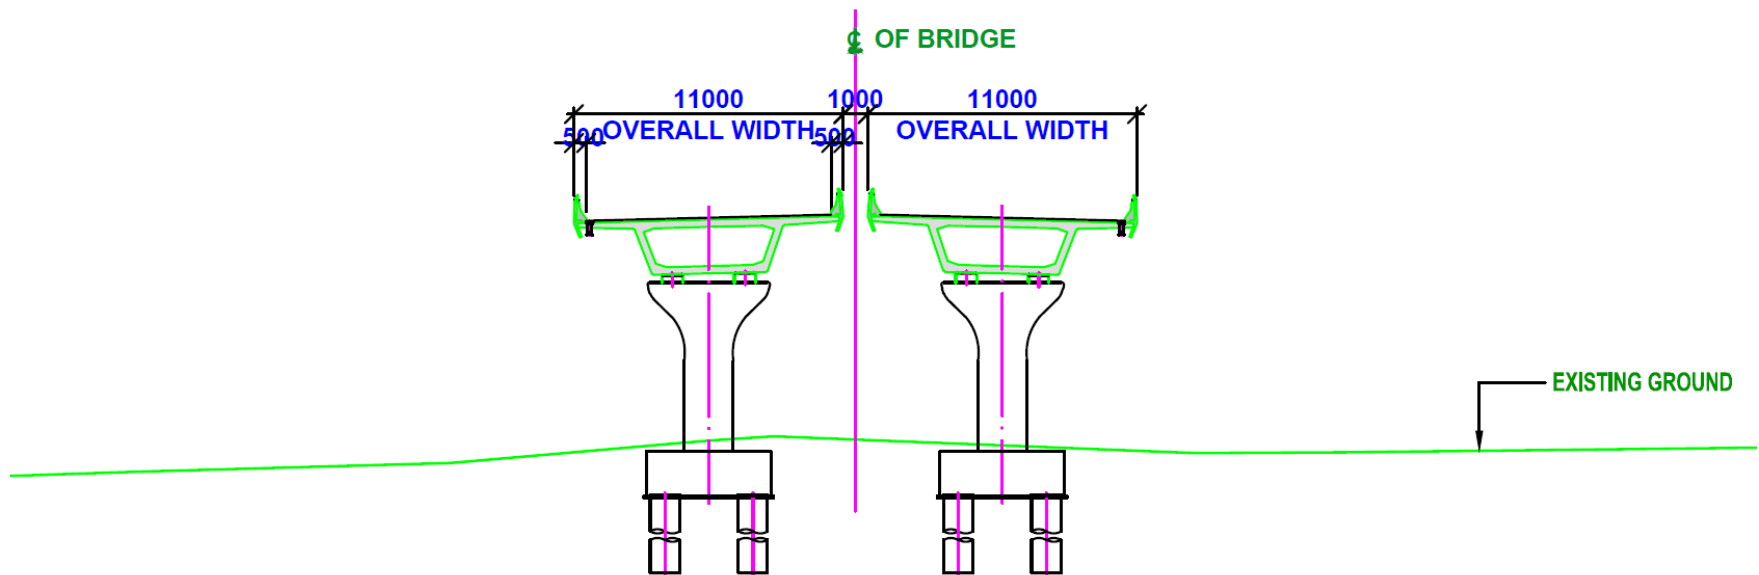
Typical Cross Section of Bridge from Kandivali Junction
